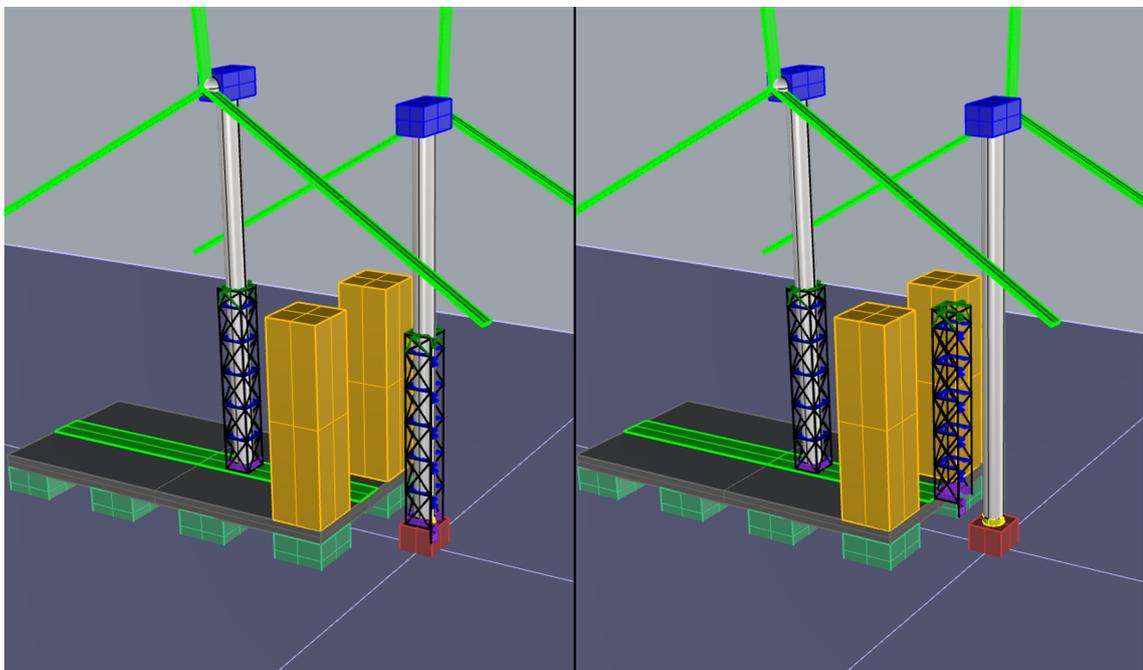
Story board installation using lifting frame part 2, Left wind turbine with opened up frame, Right detachment of frame.
